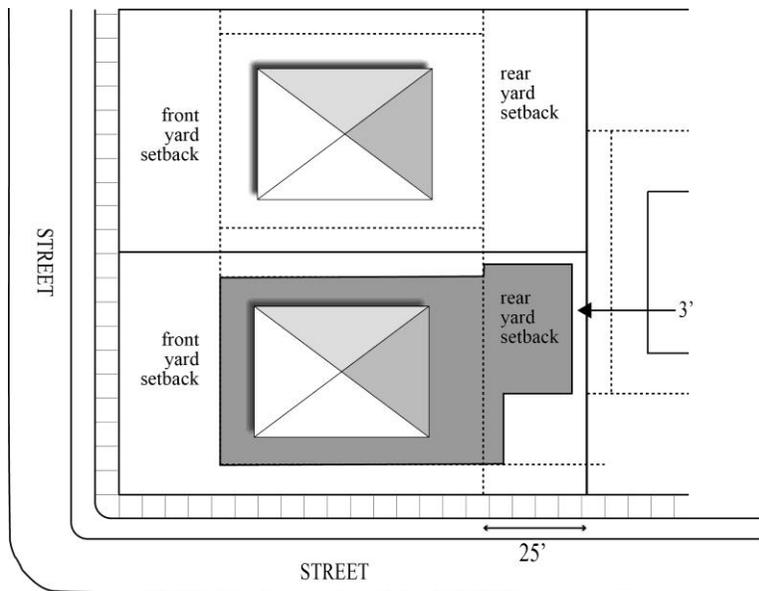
Accessory Building Placement for Reverse Corner Lots.
